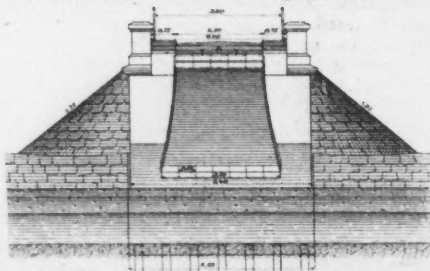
Cross-Section of Imnau Arch at the Center.
